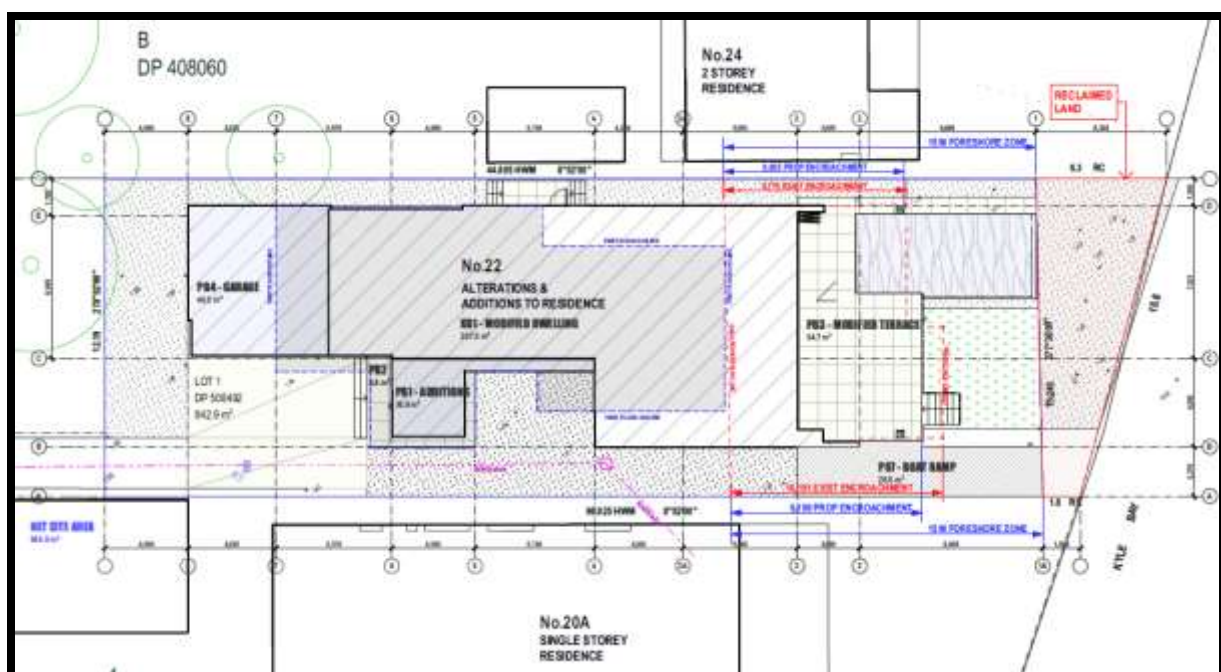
Proposed site plan- 22 Merriman Street, Kyle Bay (Source: voarc 2021).
